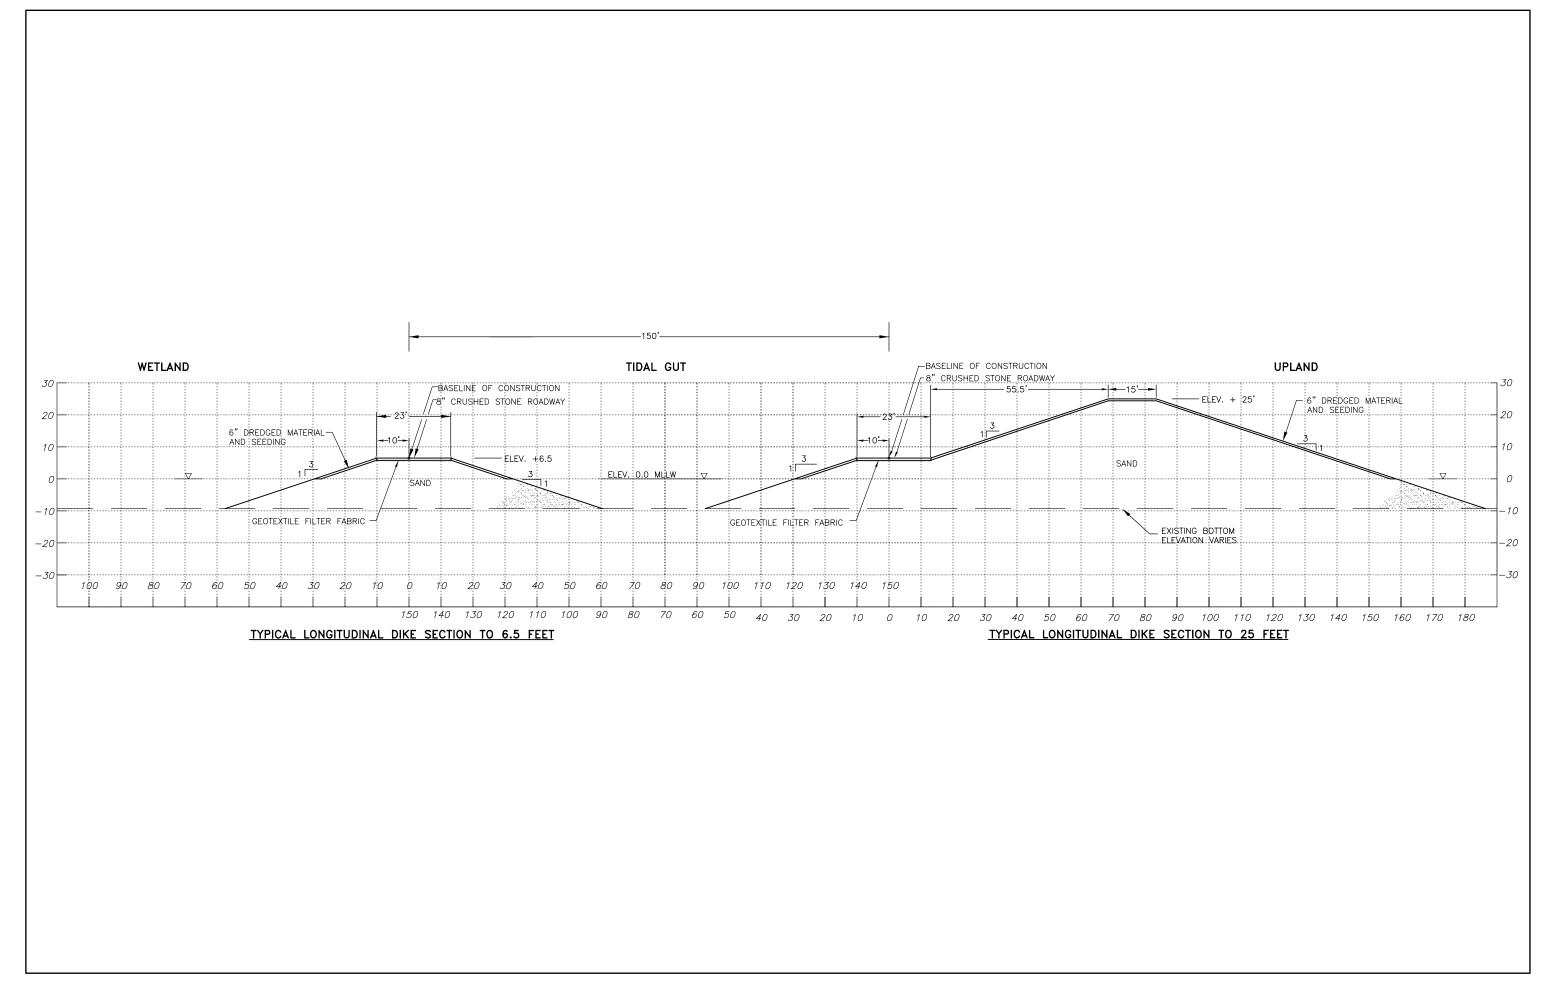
Typical Interior Longitudinal Dike and Tidal Gut Sections
